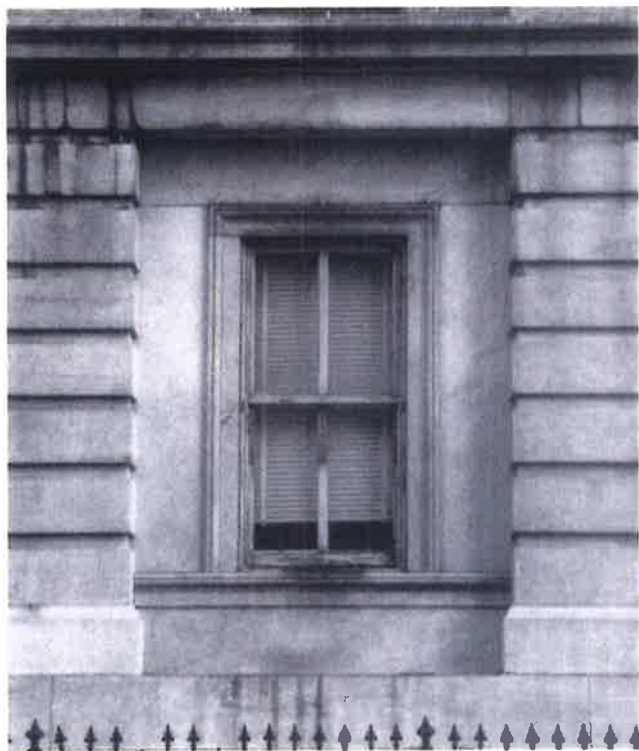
Infiltration of damp air can occur around loose-fitting or deteriorated window sash and through cracks or open joints in building exteriors. Photo: Ann Brooks Prueher.
